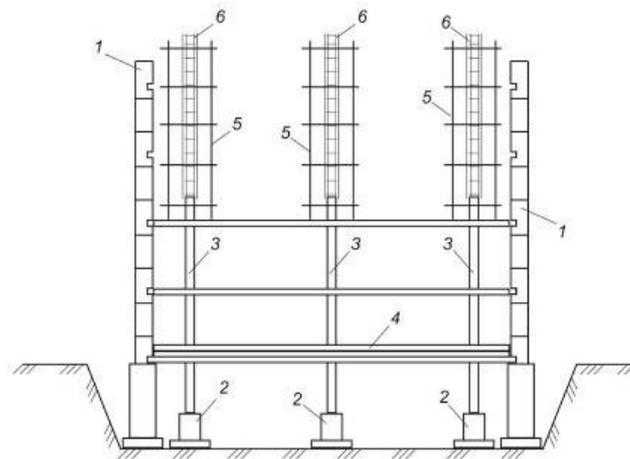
Installation of embedded frame with usage a lifting slab panels method (stage of second level columns concreting):
